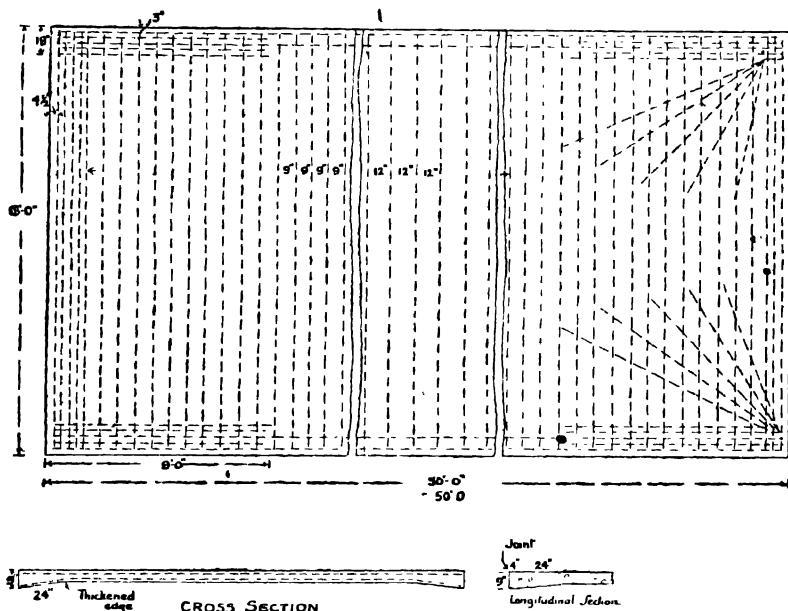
Method of Strengthening Edges and Transverse Joints with Additional Steel.
